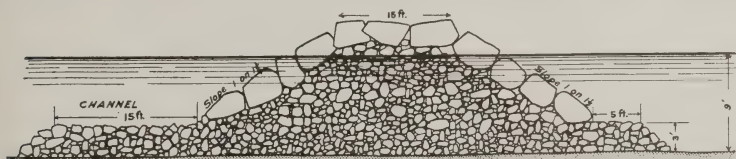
Cross Section of Haupt Jetty, as Planned by its Designers and Constructed by the Government
